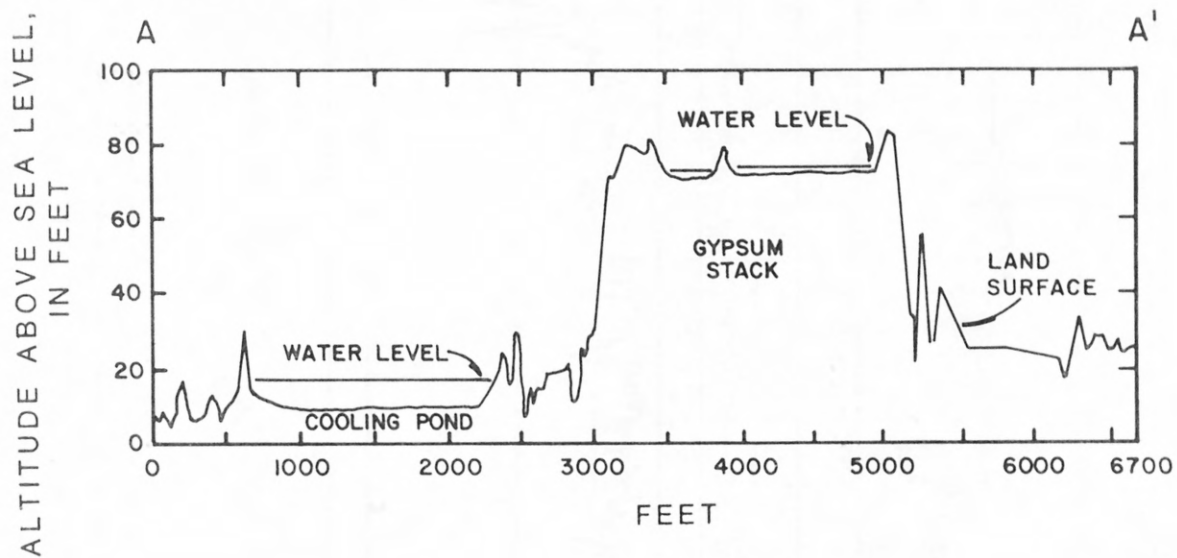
Section across the AMAX Phosphate, Inc. plant site and gypsum stack (location of section is shown in figure 2).
